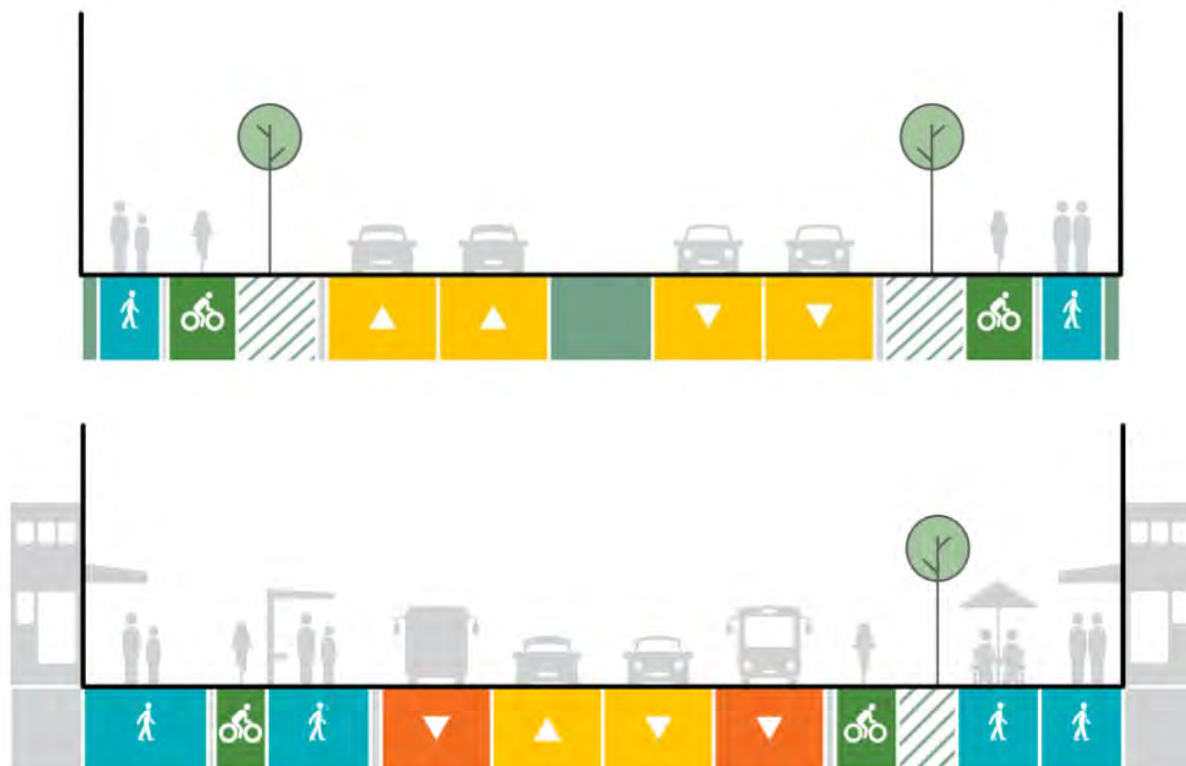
Brigham Creek Road Upgrade Typical Cross Section – Urban and Town Centre
